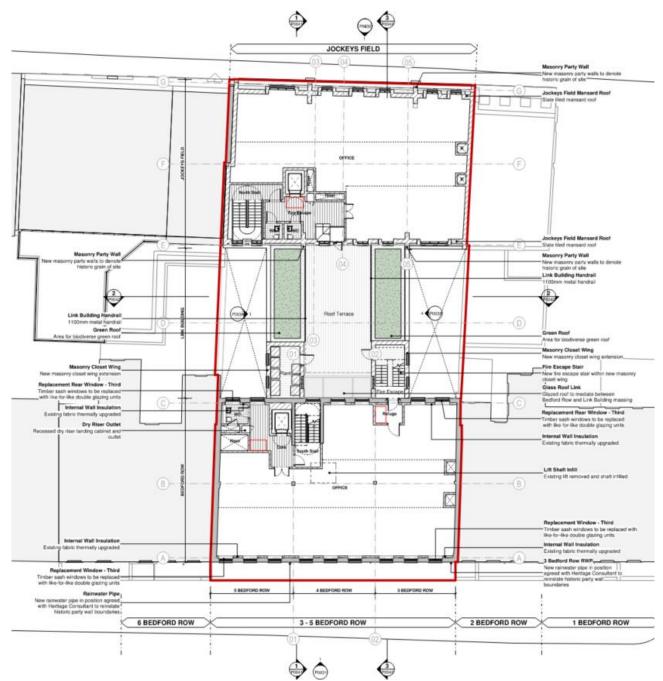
Proposed third floor plan showing area for biodiverse green roof (shaded green)
